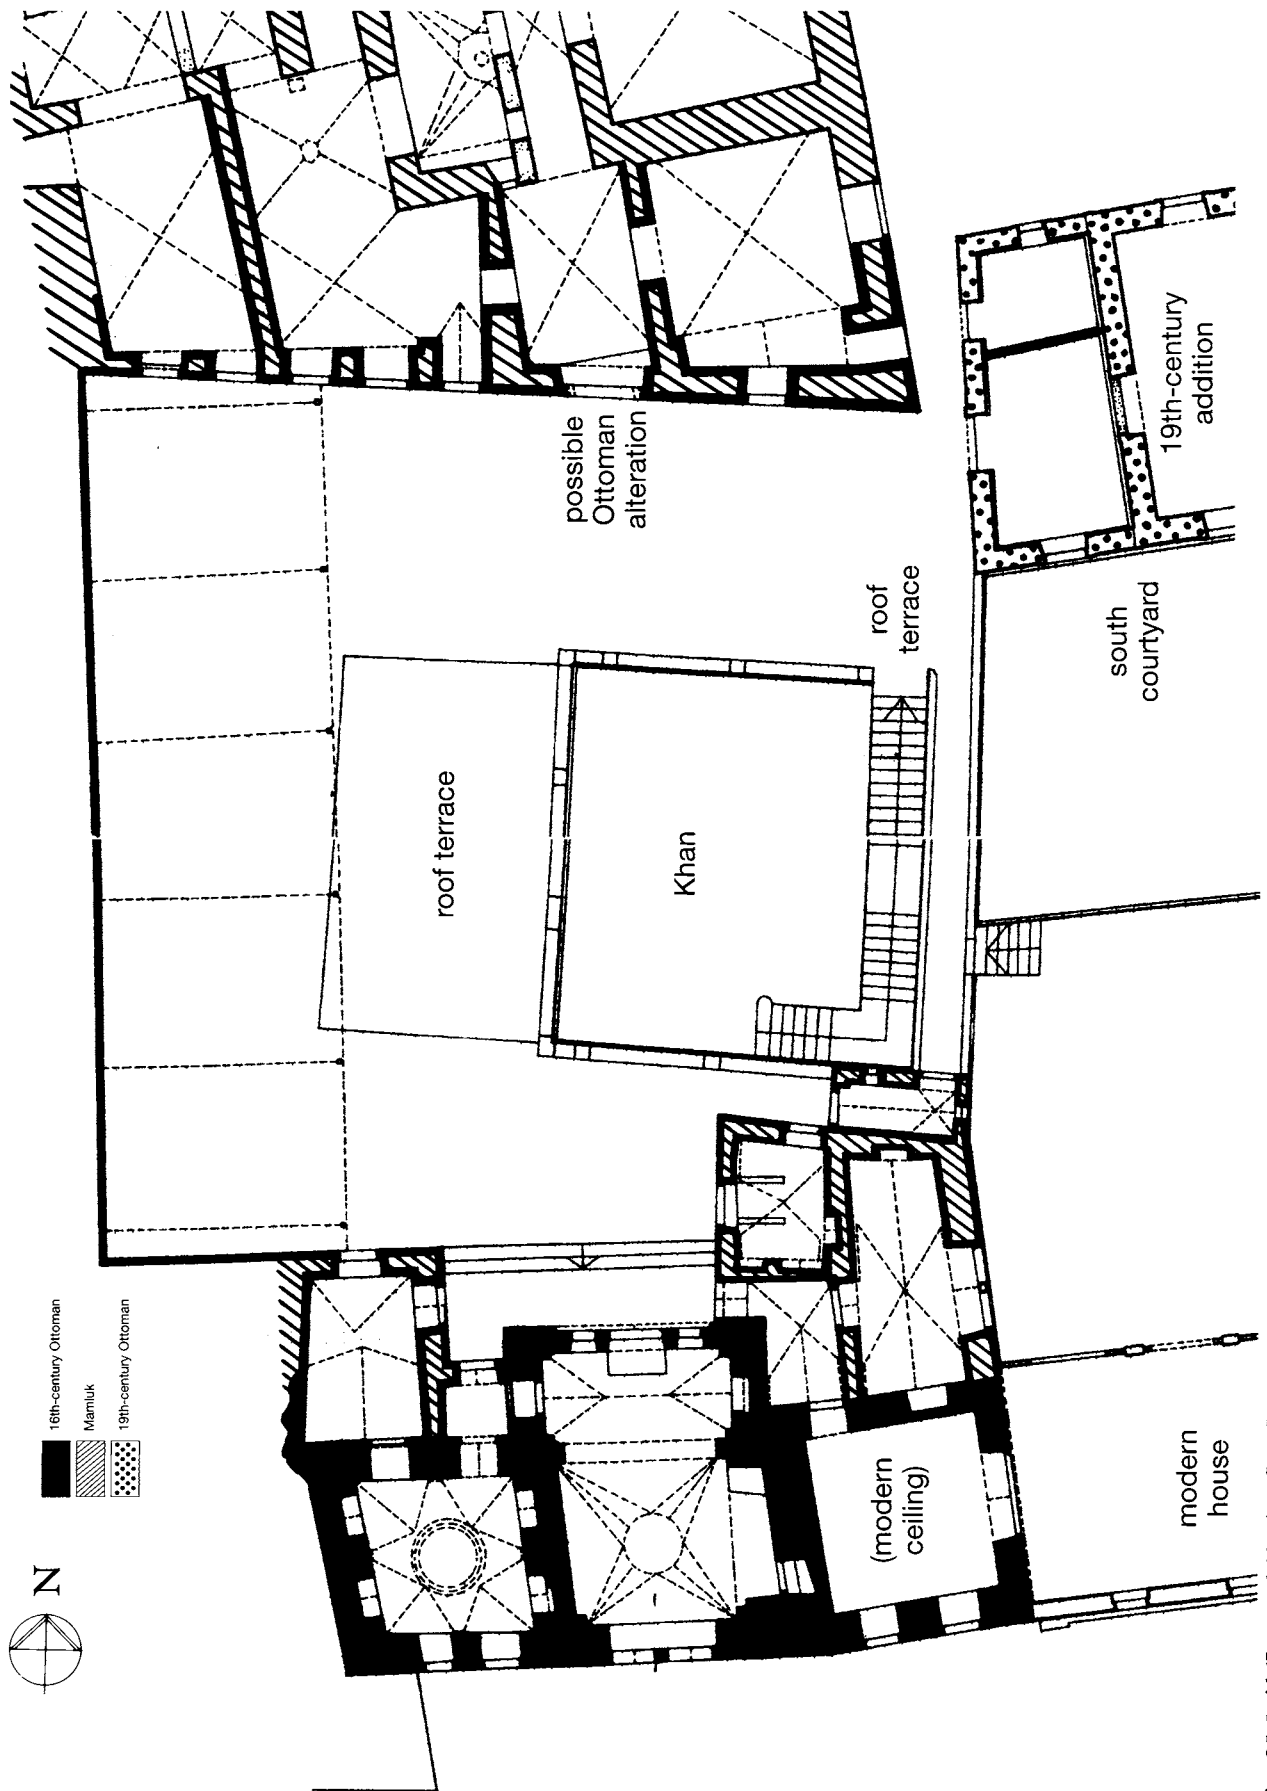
Al-Imara al-Amira, first floor plan of the south gatehouse.
